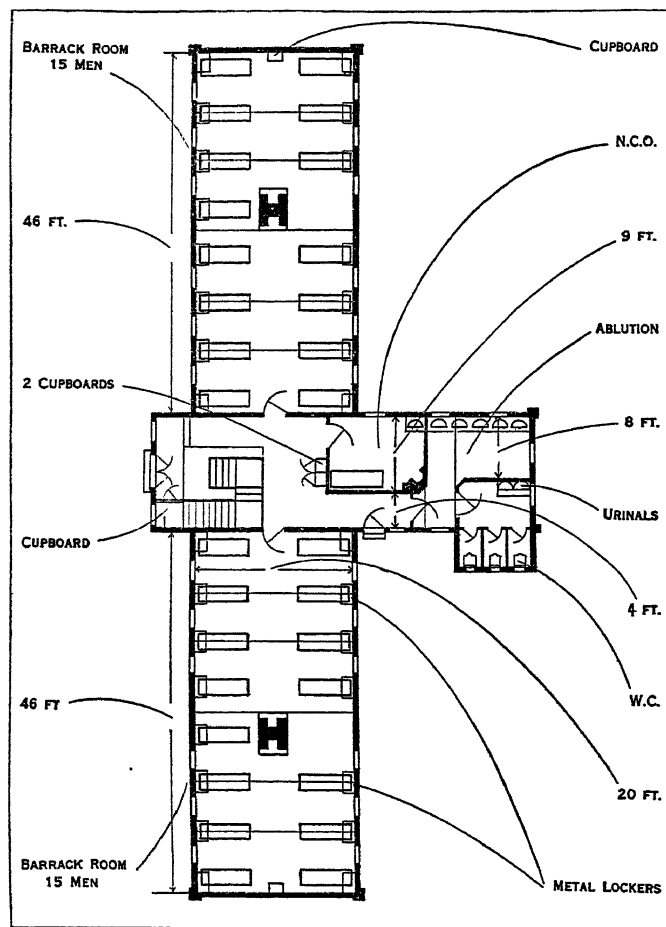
GROUND FLOOR PLAN OF A MODERN TWO-STOREY BARRACK BUILDING. THE PLAN OF THE FLOOR ABOVE IS SIMILAR
